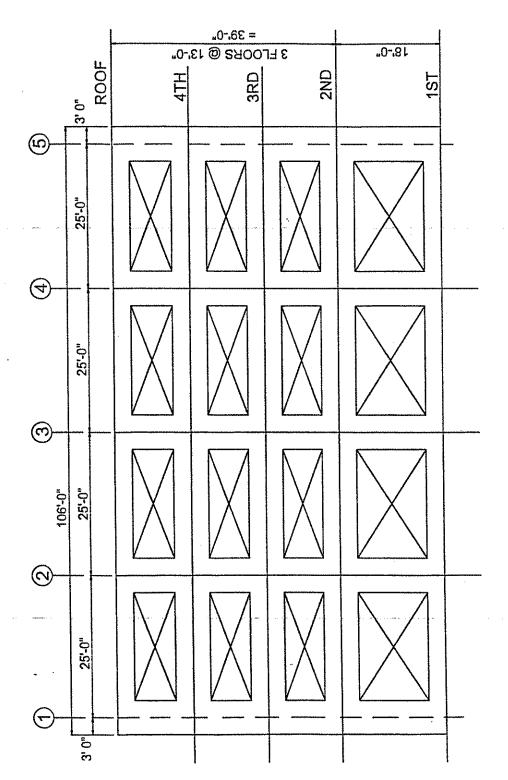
Typical Elevation of PRESSS Cladding Systems [1-26]
